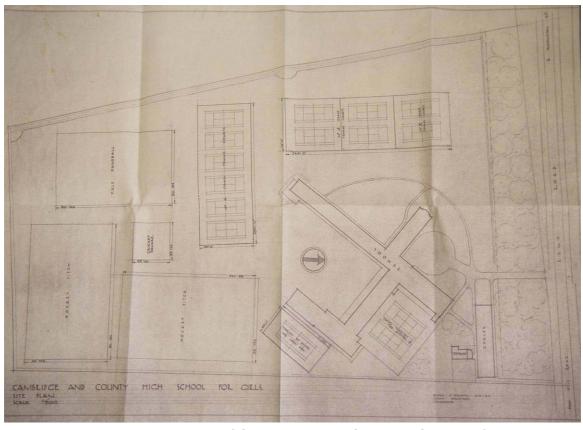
Layout of Sports Pitches, Showing Outline of Building (W.H. Wingage)
